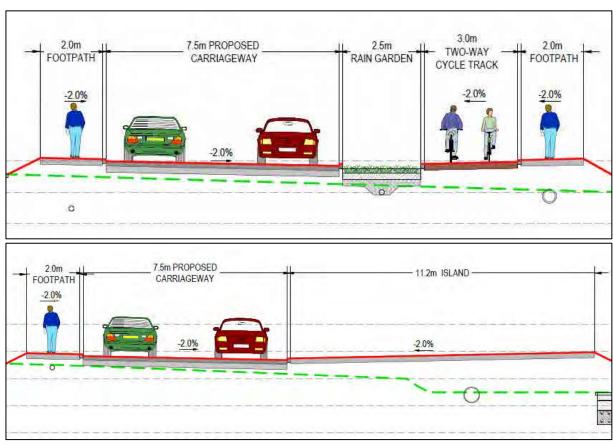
Zone A - Cross Section of Proposed Access Road.
